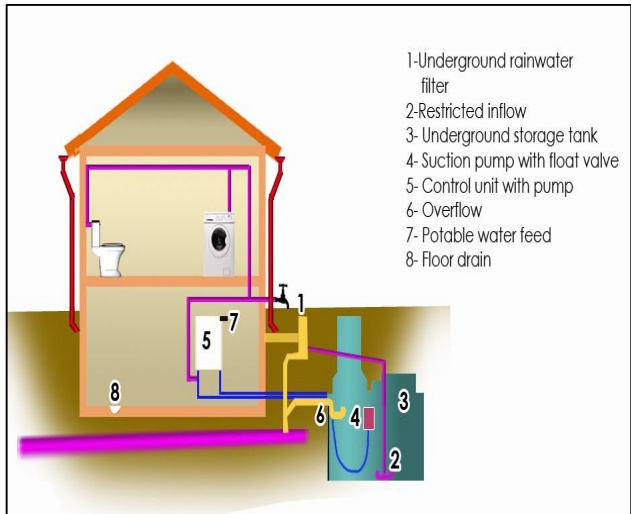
Typical Underground Tank and Pump in the Basement.
